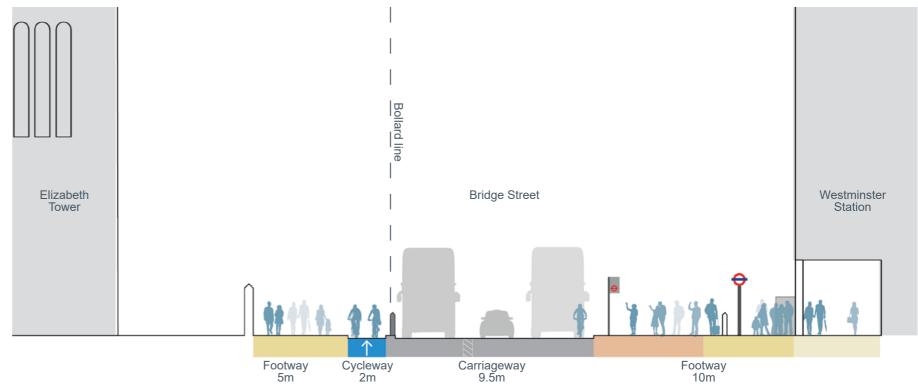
Proposed section through Bridge Street taken at the Elizabeth Tower (Big Ben)
